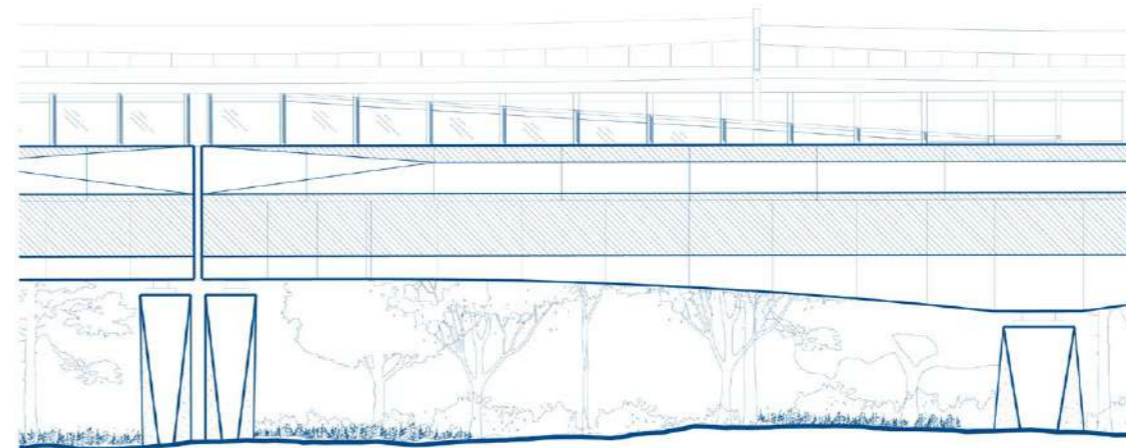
\_ Proposed Elevation - 4m hybrid to 1.65m opaque transition
